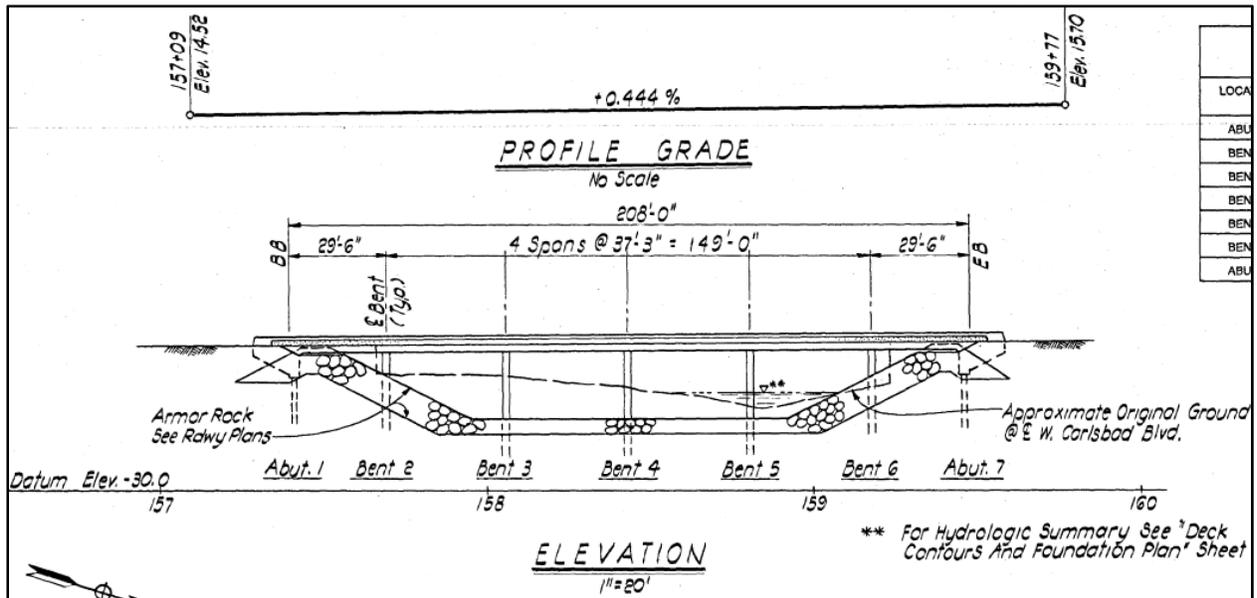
West Carlsbad Boulevard Bridge As-Built Drawing (Looking from Lagoon to Ocean)
